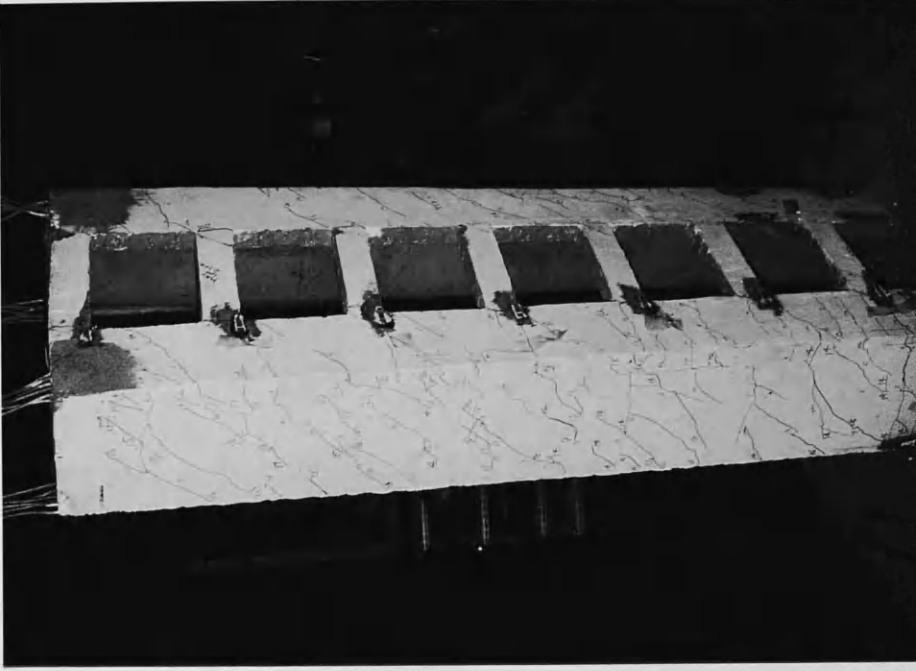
Crack pattern in back wall and side wall 2 (Model 2)
